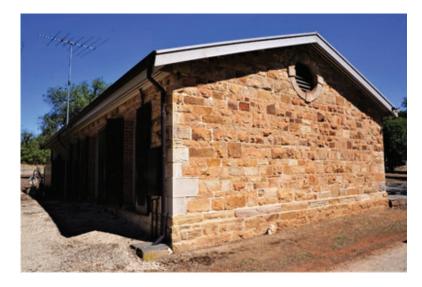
The external face stonework, general form of original section, circular vent detail in gable.
